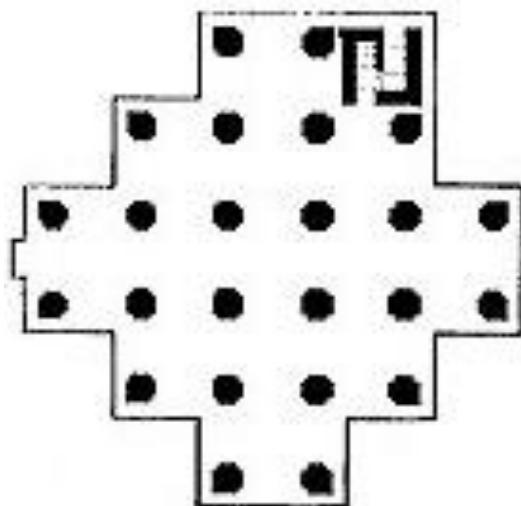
Plan of Lotus Mahal Palace, India (URL.22, 2013)
